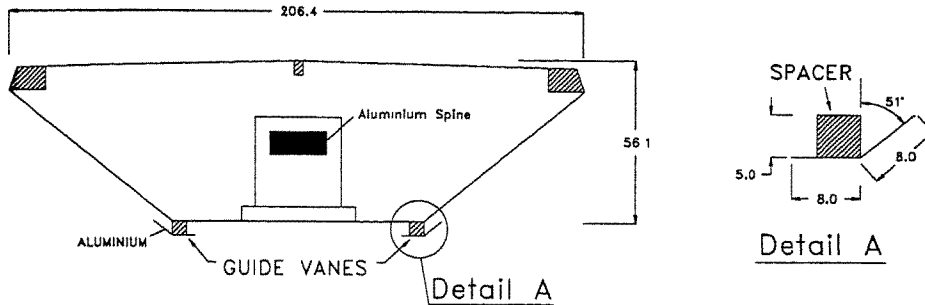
Cross-section of Deck Segment with Guide Vane Arrangement in Model Scale (mm)
